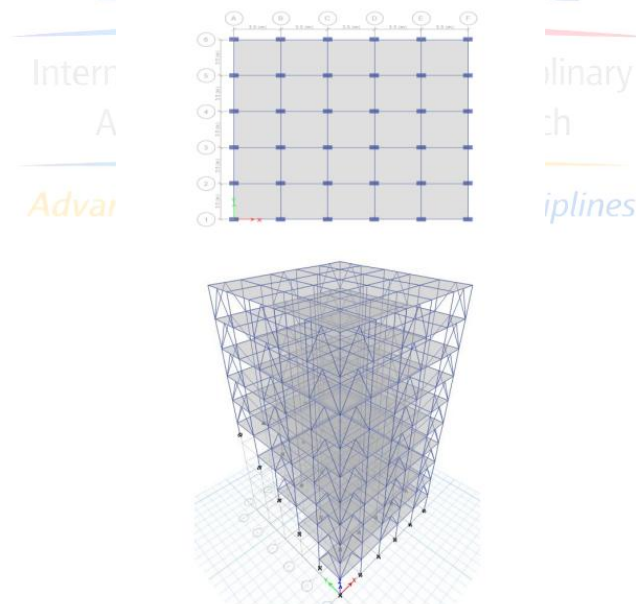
Plan and 3D Model of Sloped Building with Inverted V Bracing
